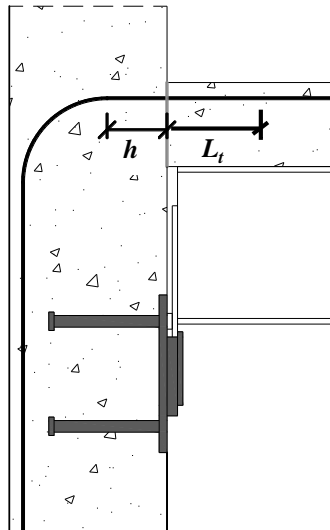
Definition of dimension  $h$  for the elongation length of the joint component longitudinal steel reinforcement bar in the wall
